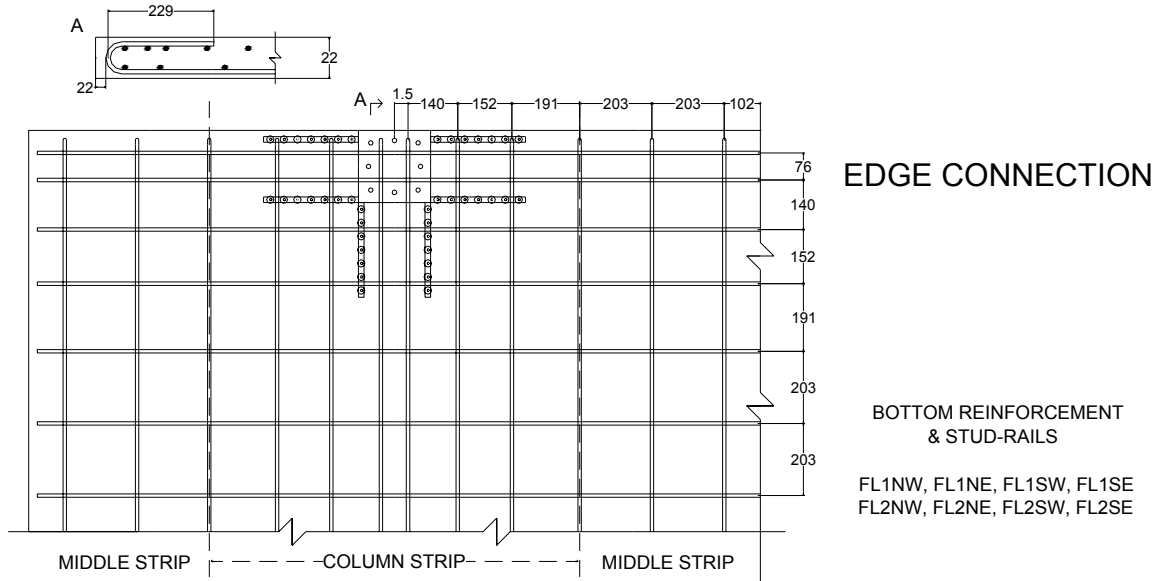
(c) Details of bottom reinforcement (RC specimen)
